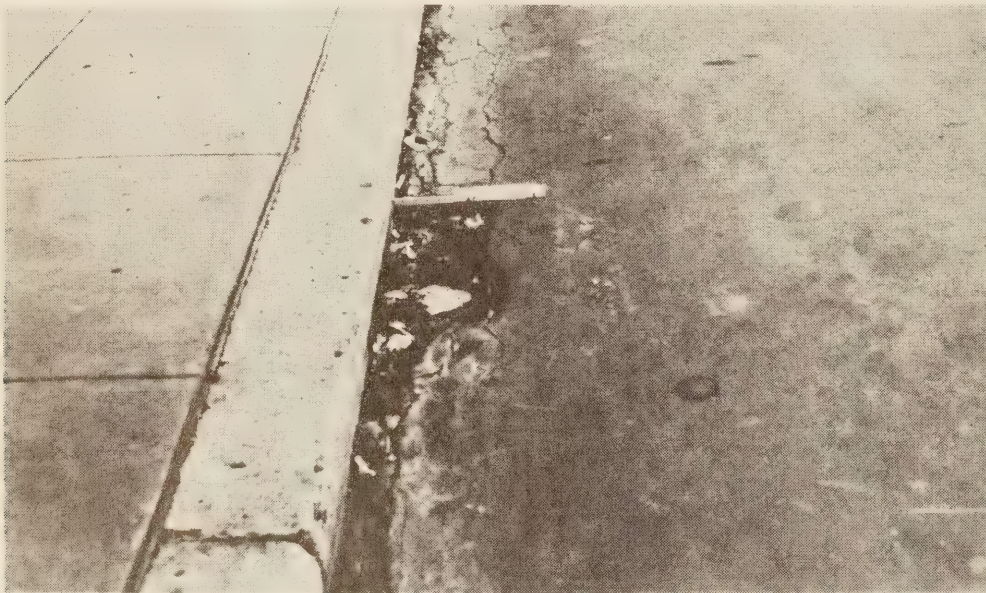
View of sheet asphalt surface failure in June 1946 (south of section C-1) caused by surface water at the curb line.
